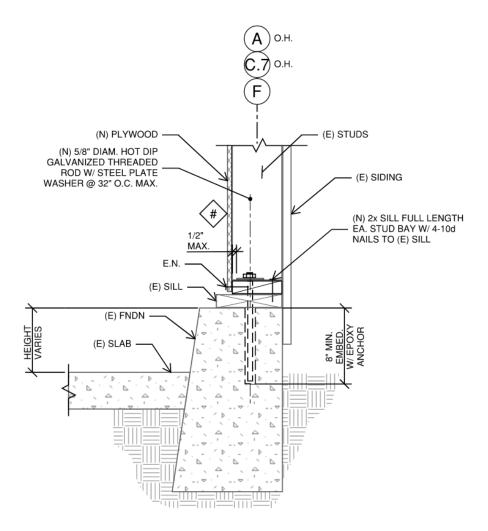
Shear load path connection at base of retrofit shear wall.
